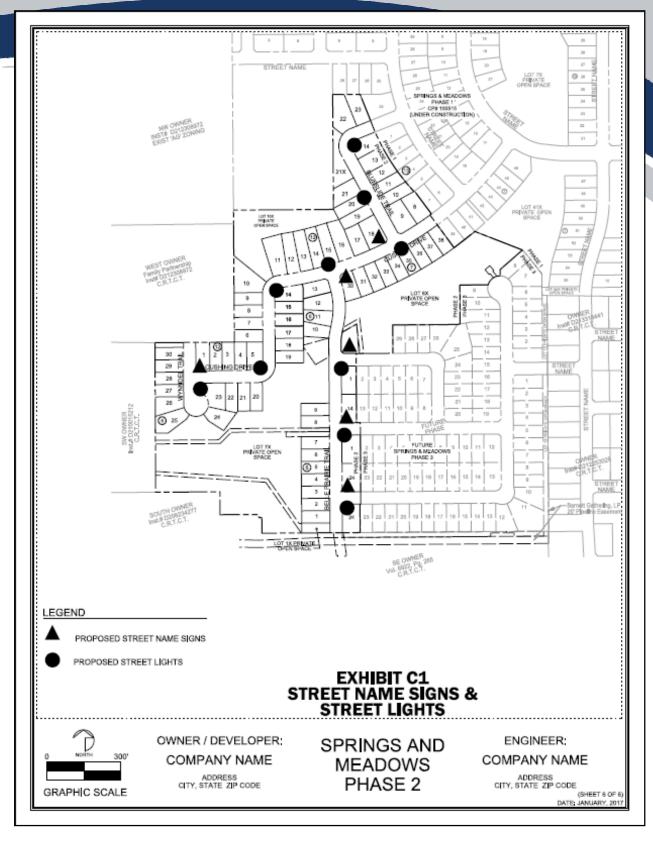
STREET NAME SIGNS & STREET LIGHT IMPROVEMENTS
